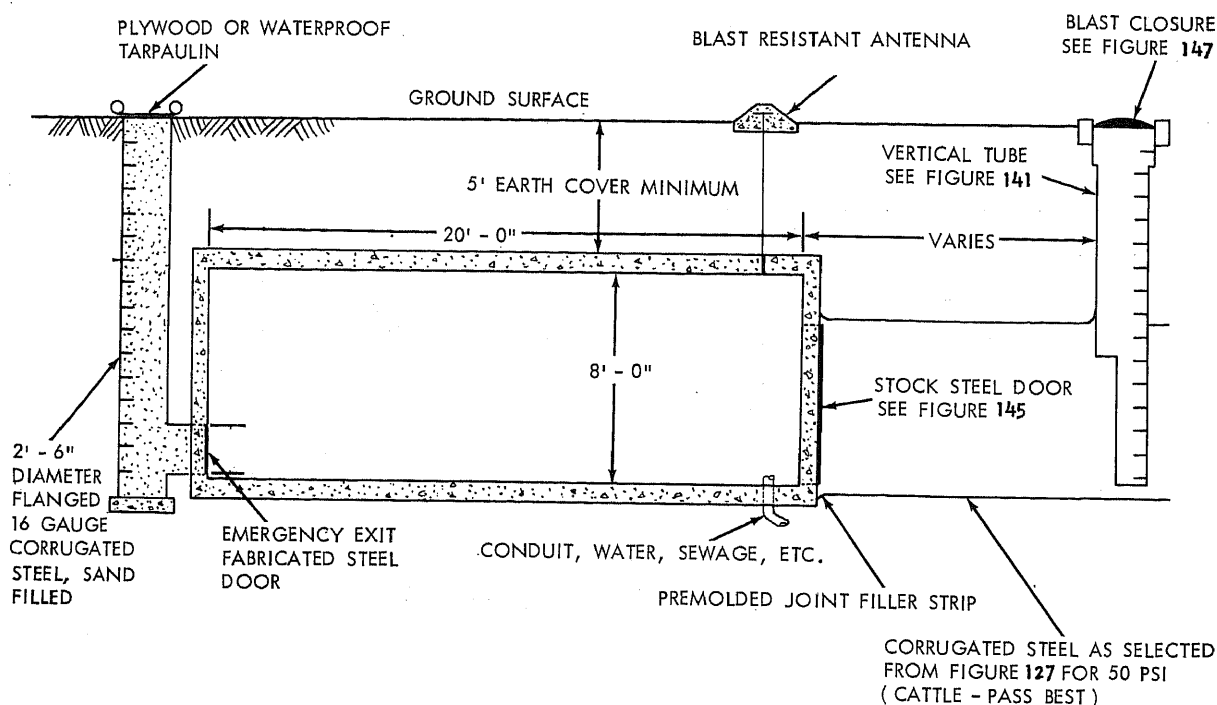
Suggested arrangements of components with rectangular, reinforced-concrete structure.
